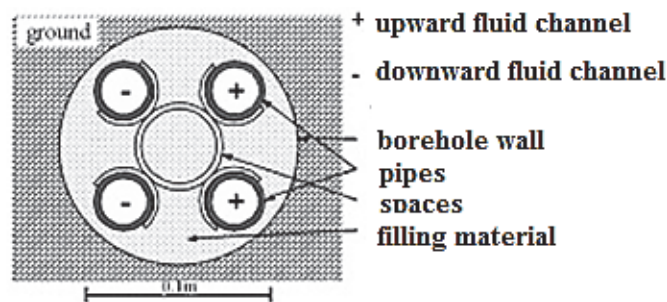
Schematic layout of a typical double U-tube heat exchanger: cross-section of borehole [7]
